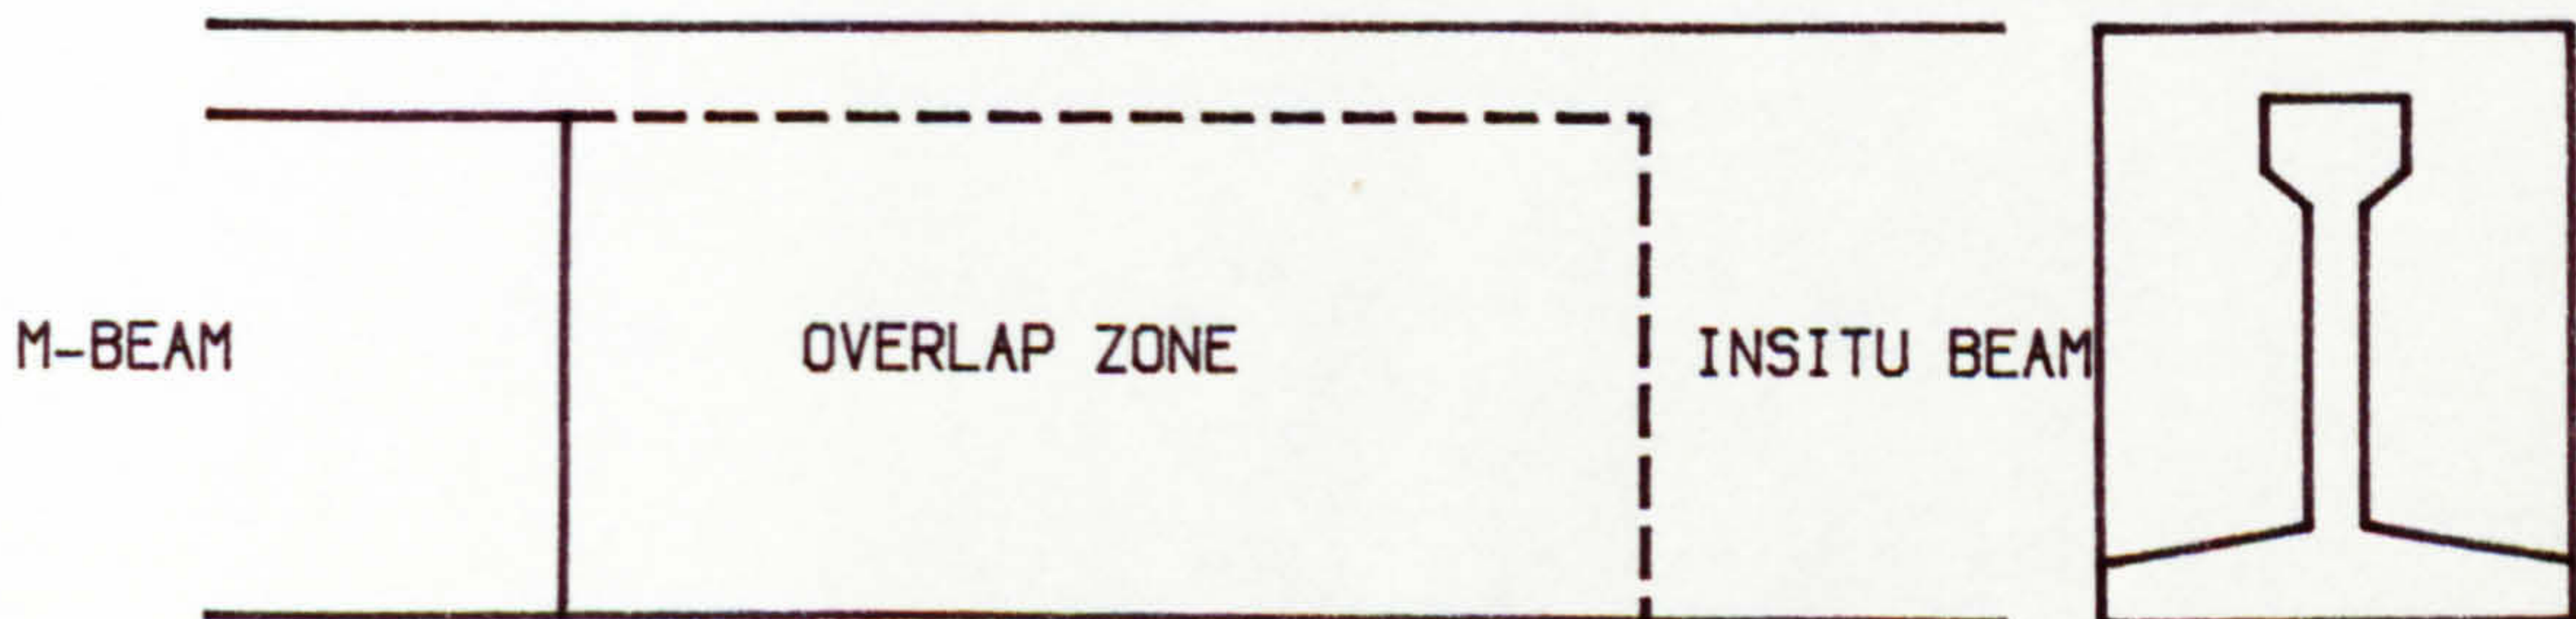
VERTICAL SEPARATION BETWEEN PRECAST BEAM AND INSITU NIB
